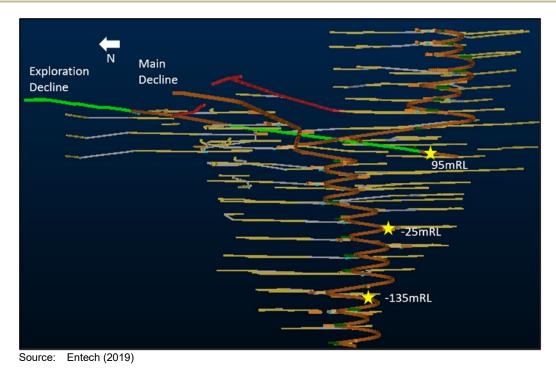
Conceptual dewatering layout with 103 mono pumps (yellow)
